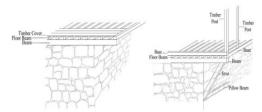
Round section floor beams rest on a single timber base 'picture in left' and timber beams rest between two wall bases 'picture in right'
